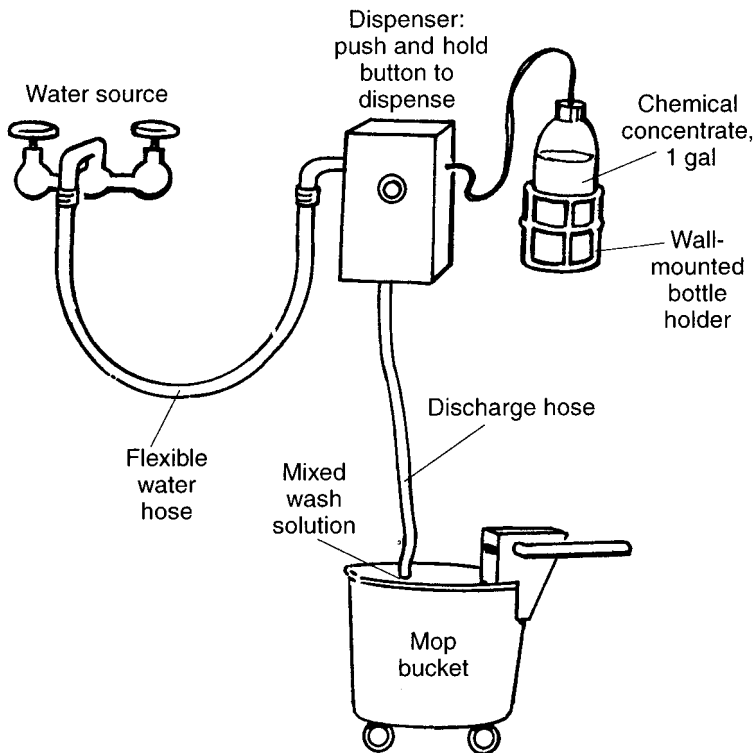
Typical single-station detergent-dispensing system detail.
